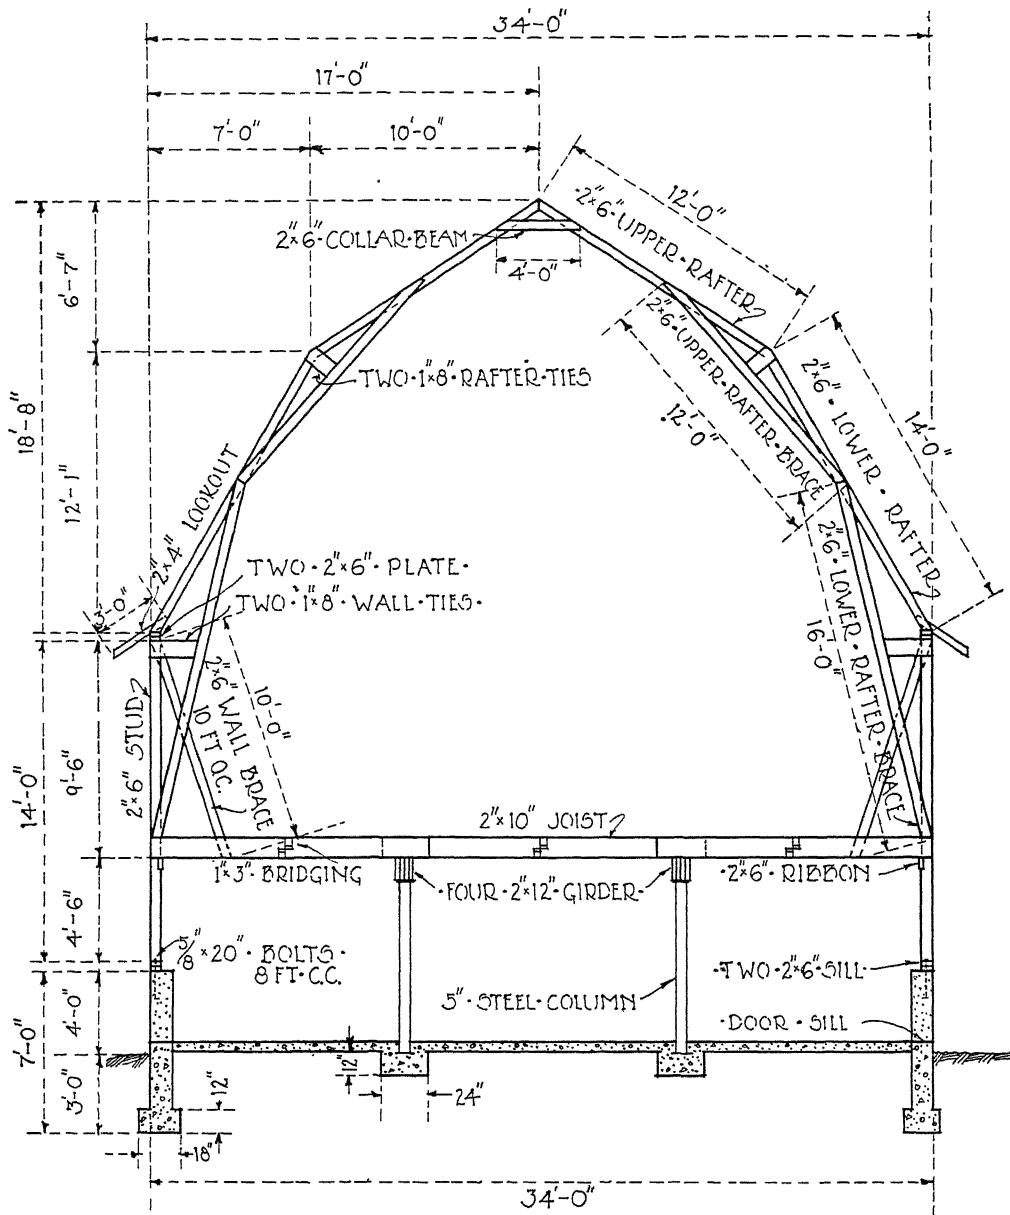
Cross section of a 34-foot braced rafter barn. Only framing details are shown. All rafters, rafter braces, ties, lookouts, studs, and joists are spaced 24 inches on center. Wall braces are 10 feet on center. Lookouts same slope as upper rafters. (For wall and rafter tie details see Figs. 5 and 6. Girders shown in detail in Figs. 13 and 14.
